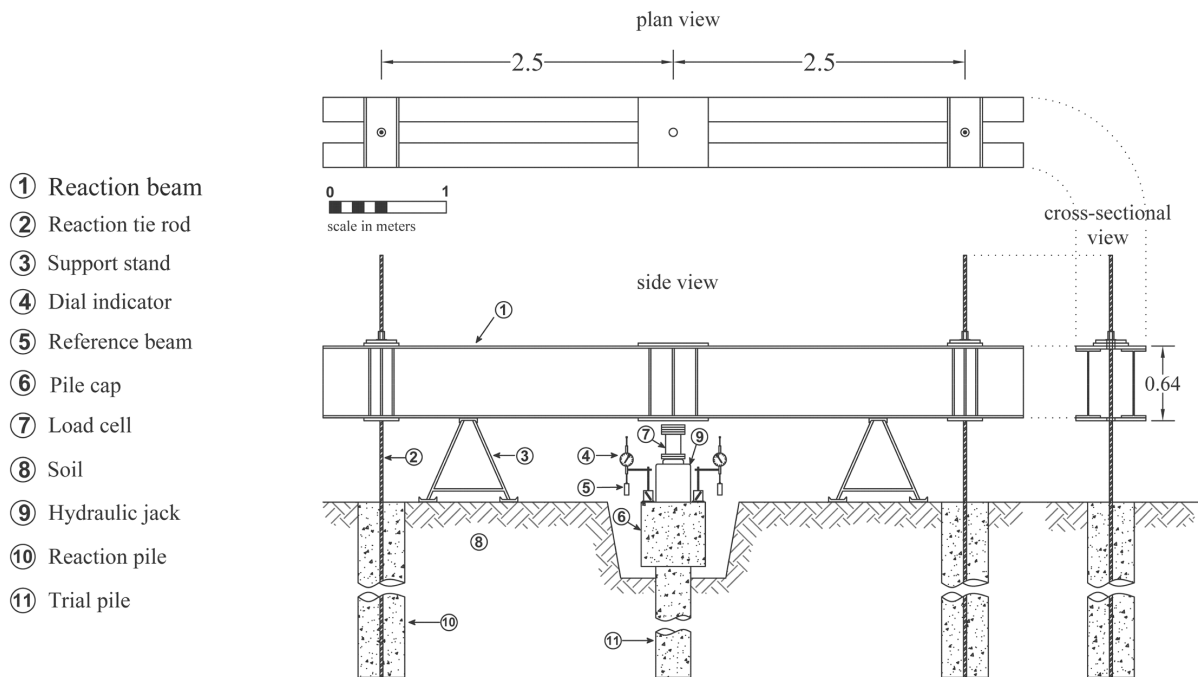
Schematic of the static load test on a composite foundation system (Garcia, 2021).
